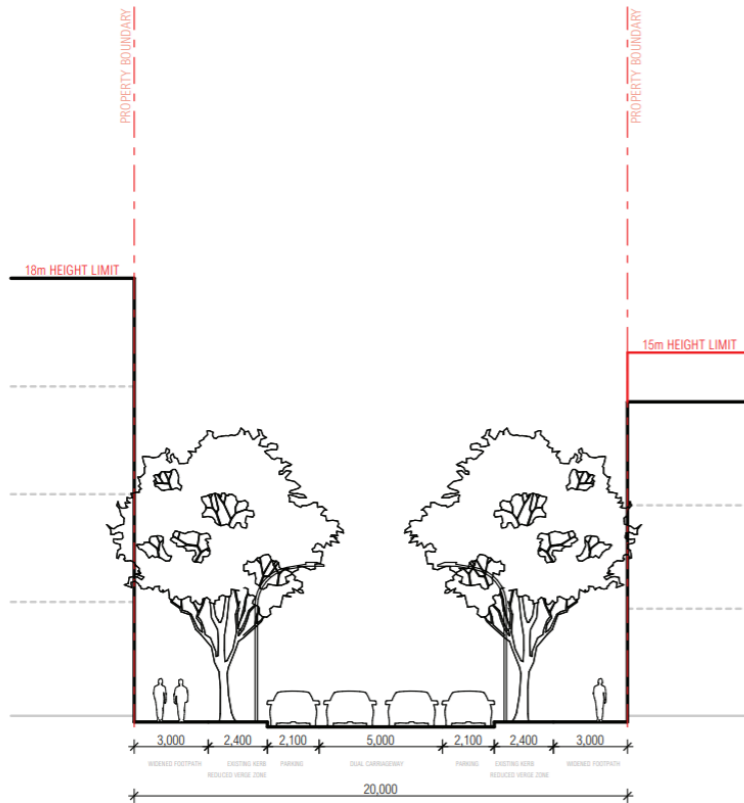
Indicative street section – McCauley Street, North Alexandria
